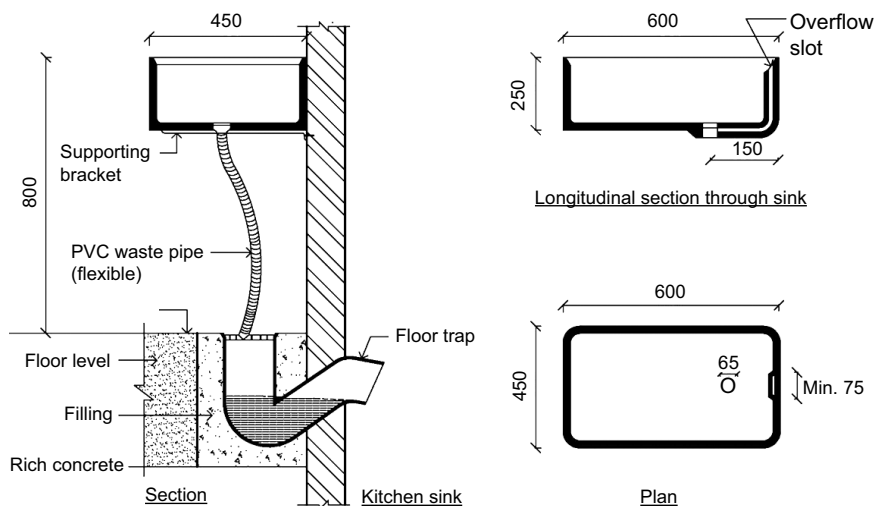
Fixing of a kitchen sink with the waste pipe connection to the floor trap
